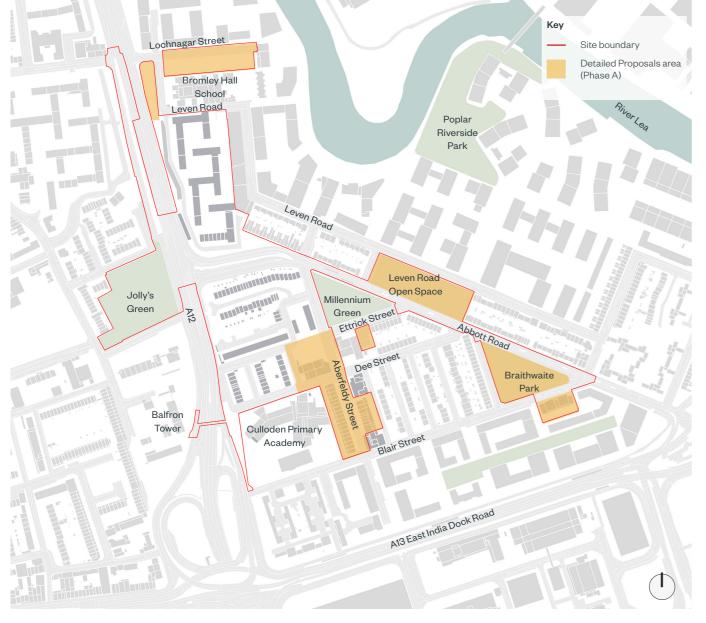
Site plan showing the extent of the Detailed Proposals of the hybrid planning application
